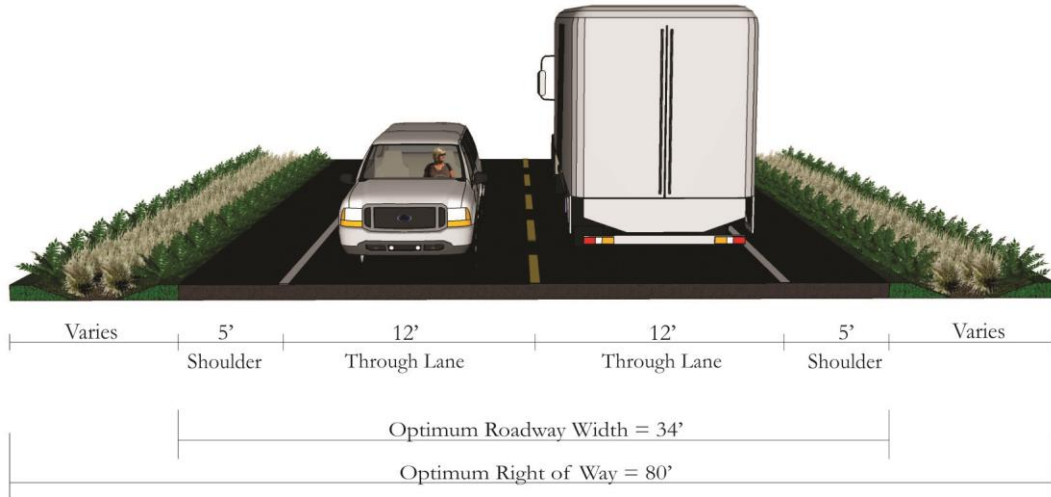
Major and Minor Collector Roadway, outside an UGB
